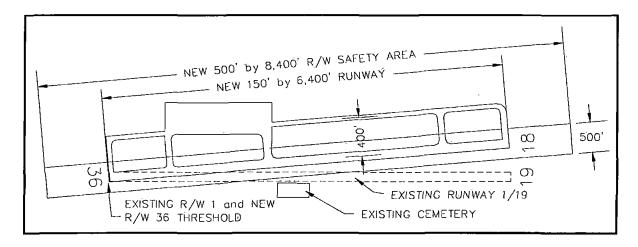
; ALTERNATIVE B - PLAN VIEW LAYOUT
